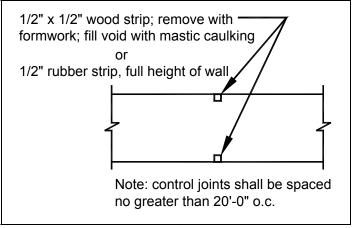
TYPICAL CONTROL JOINT DETAIL
